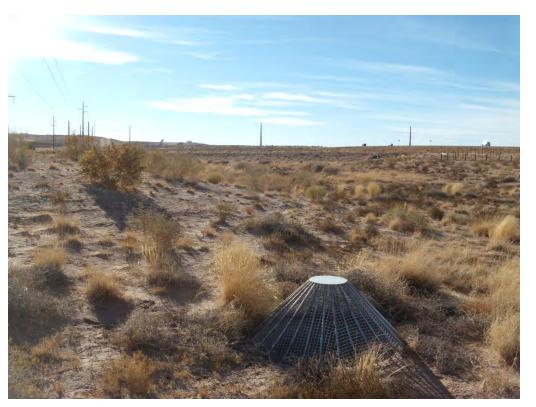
Pond # 13 (WC\_01P, capacity ≈ 3 AF), looking west from the outlet.
